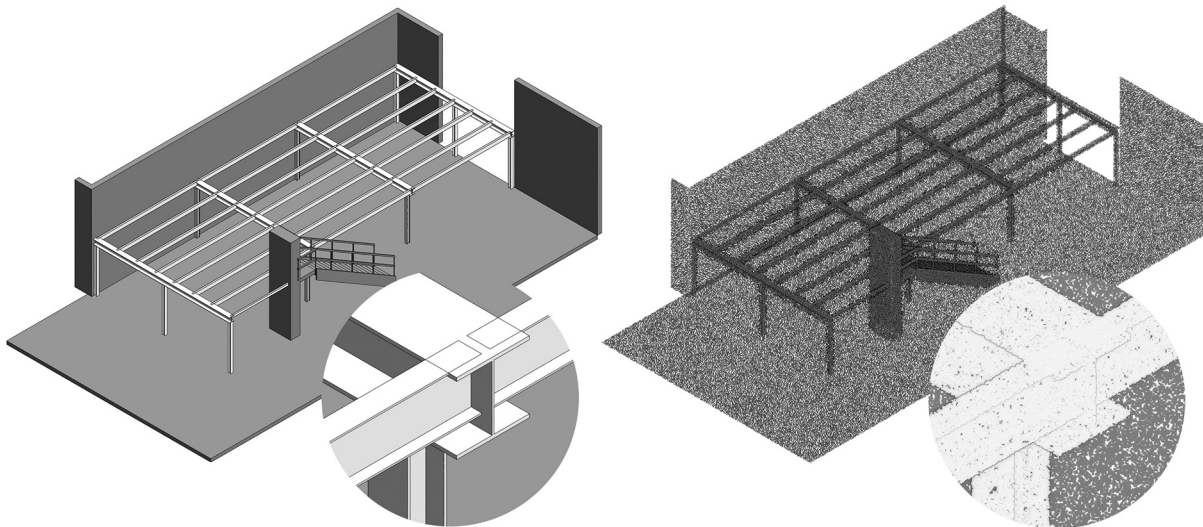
Ground truth BIM model (left) and example synthetic point cloud (subsamped to show detail).
